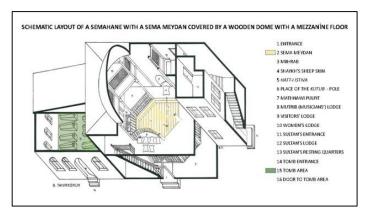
Schematic layout of a semâ meydan covered by a wooden dome with a mezzanine floor [1]
